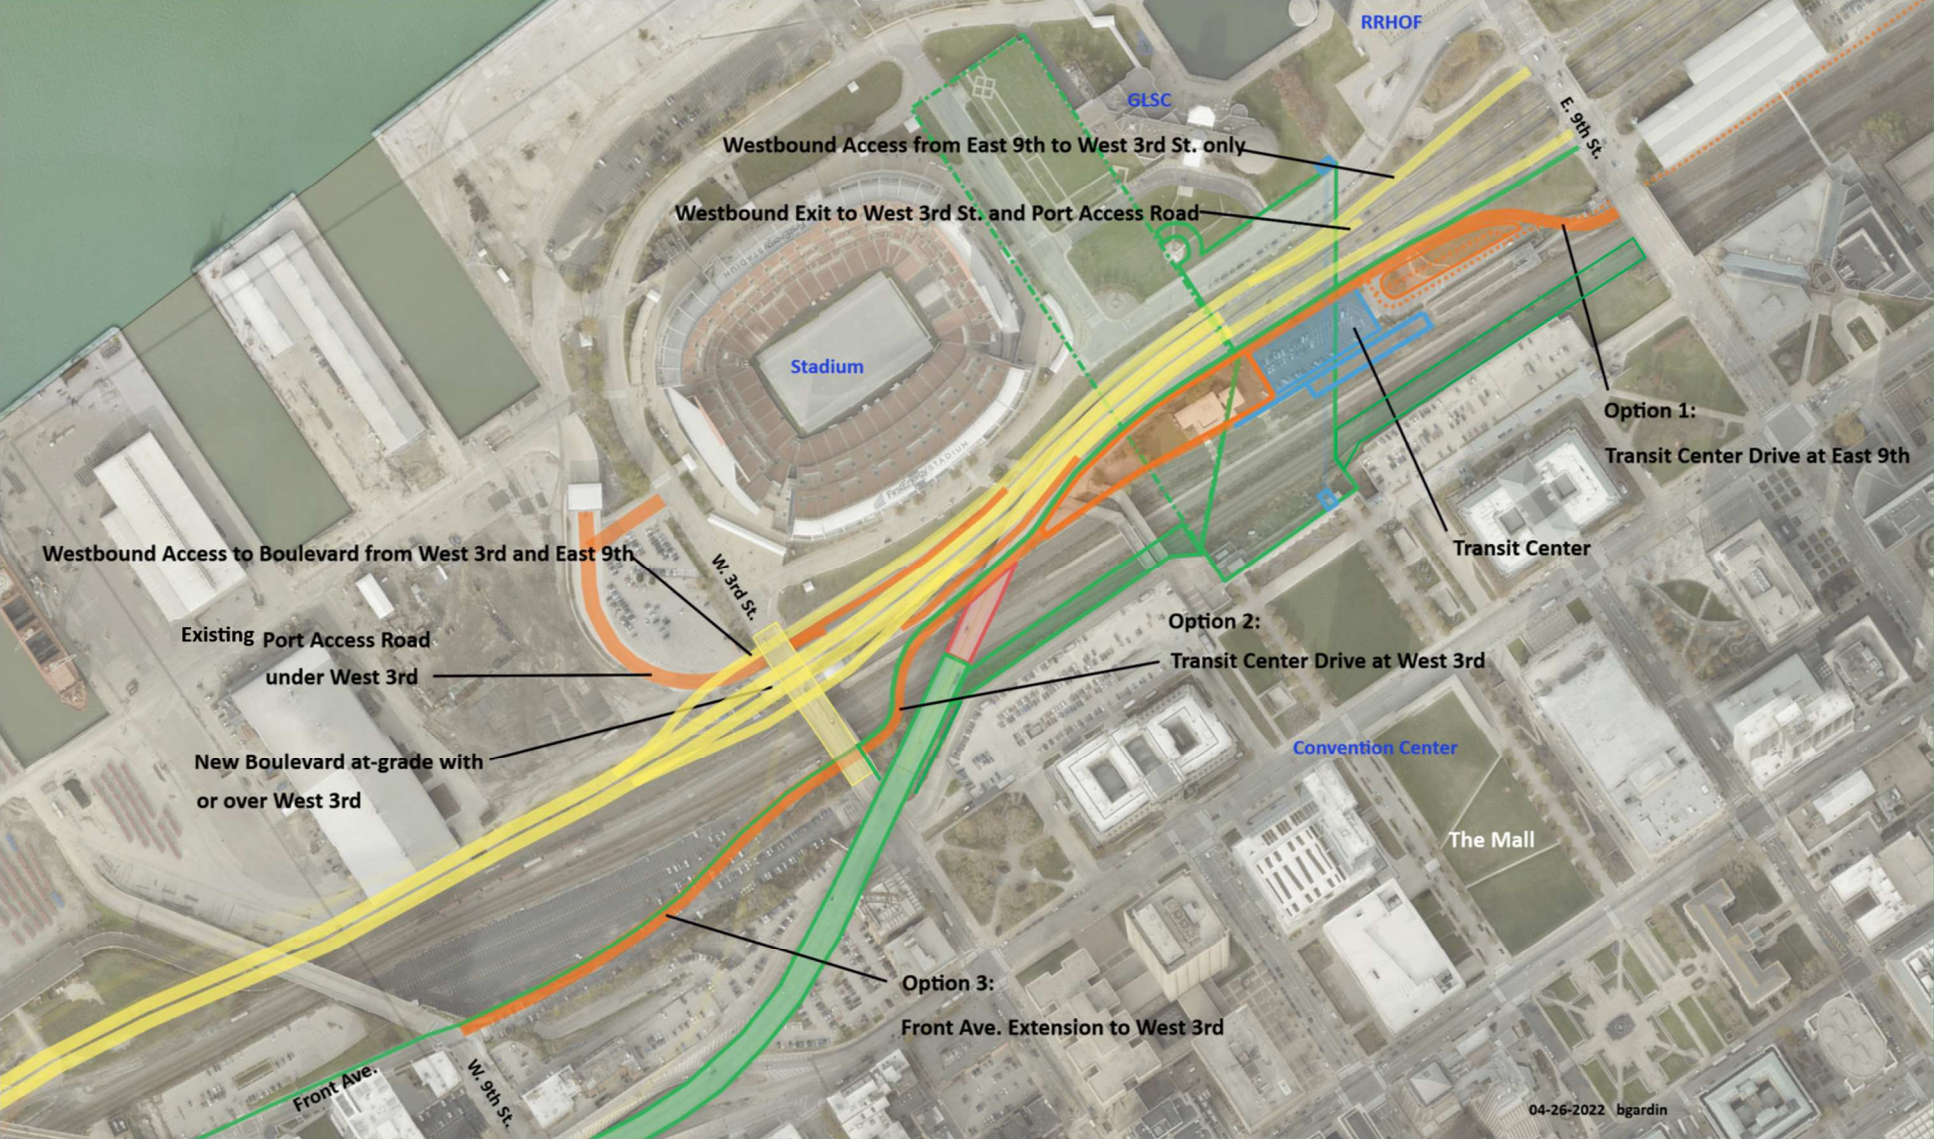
Downtown Lakefront Shoreway Access and Roadway Options
